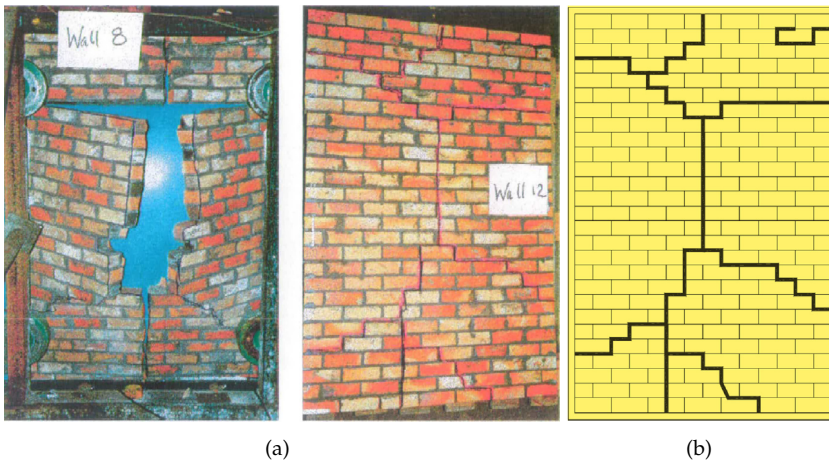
Experimental crack pattern: (a) photos of the failure of Wall 8 and Wall 12 from [348] and (b) sketch of the crack pattern of Wall 12.
